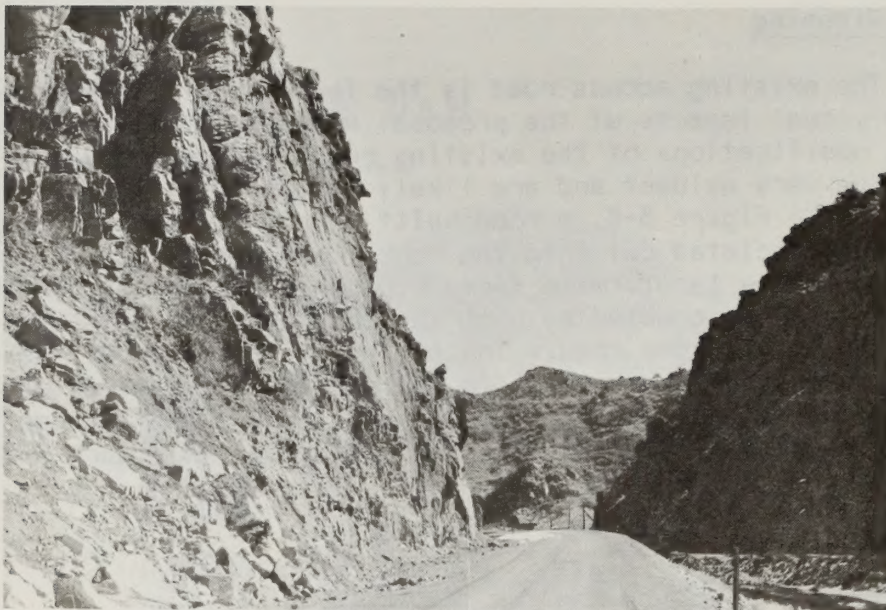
Existing access road constructed to a 22-foot standard in Waterton Canyon.
